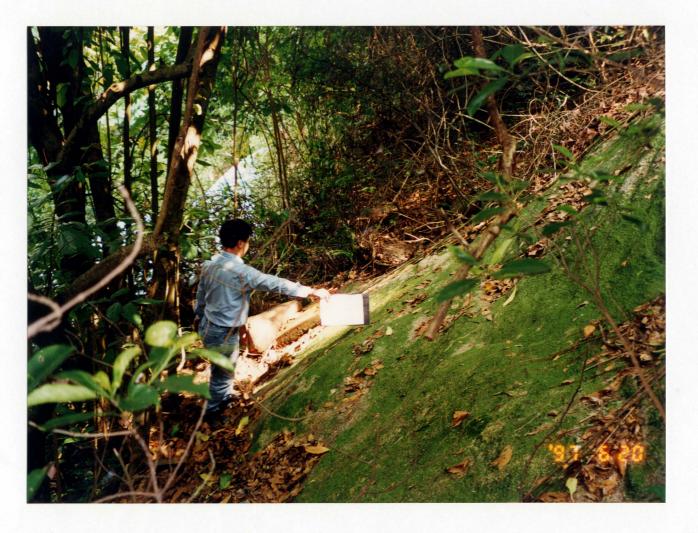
A Sheeting Joint Rock Surface Above Landslide A (Photograph Taken on 20 June 1997)
